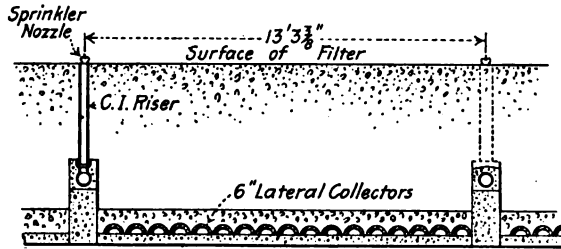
Section of floor of trickling filter at Columbus, Ohio.
